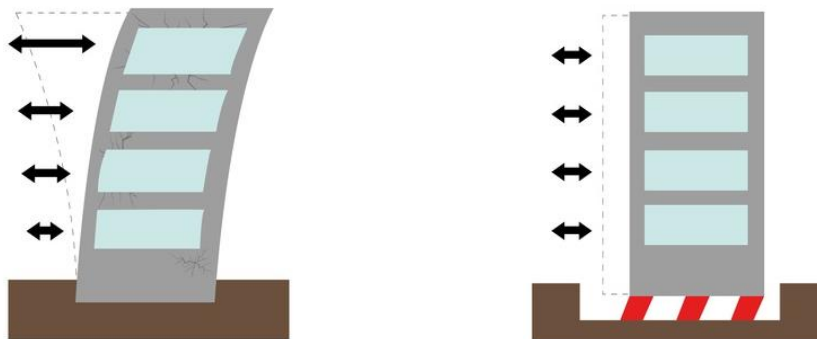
Two types of building structures: fixed-base building and base-isolated building [13]
